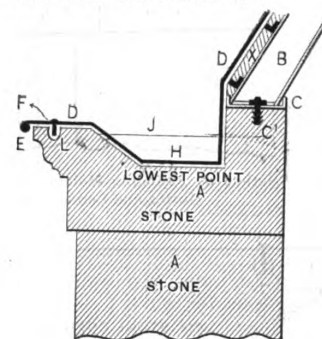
Lining Stone Gutter with Sheet Copper.
